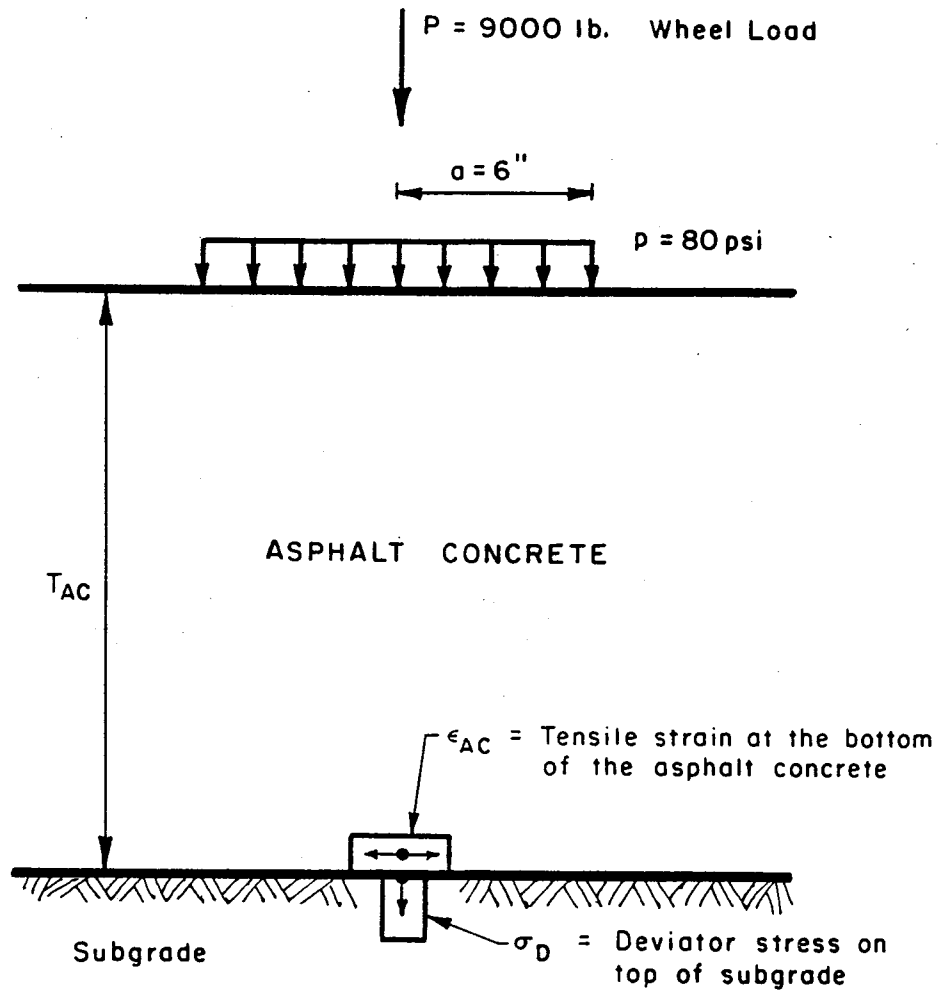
Typical Full-Depth Asphalt Concrete Pavement.
